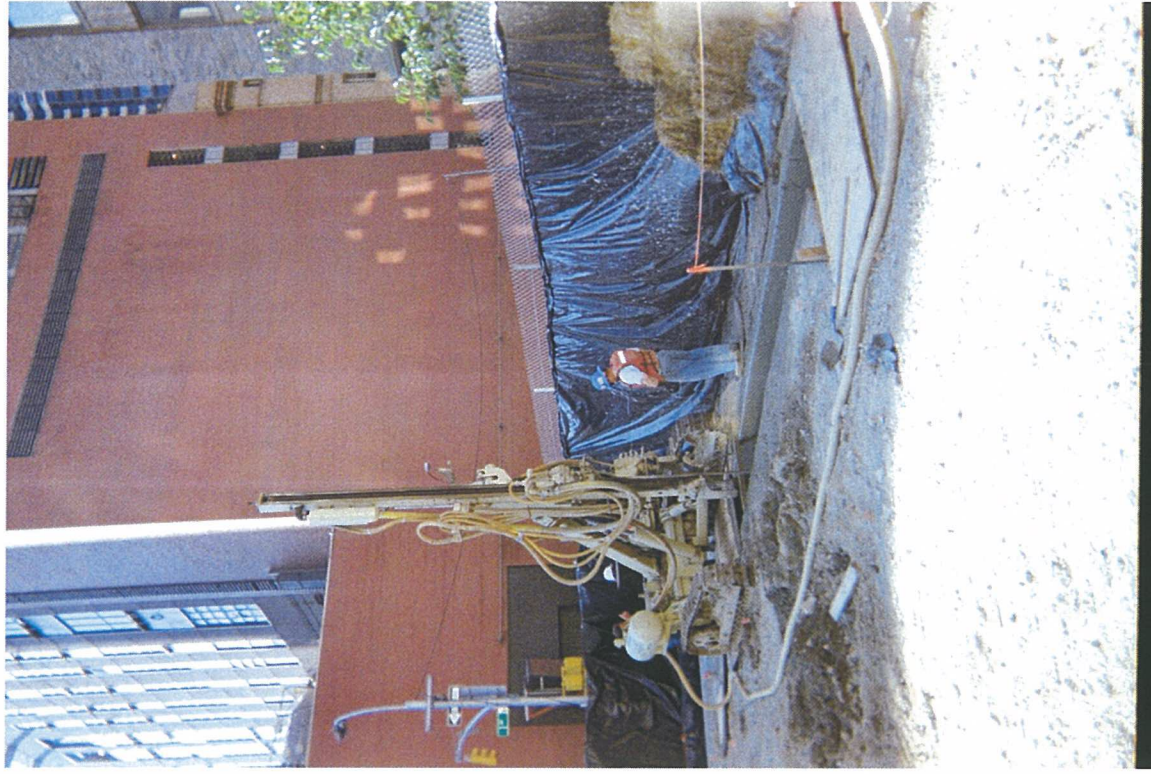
Drill rig used to assist in establishing rock key for barrier wall.
